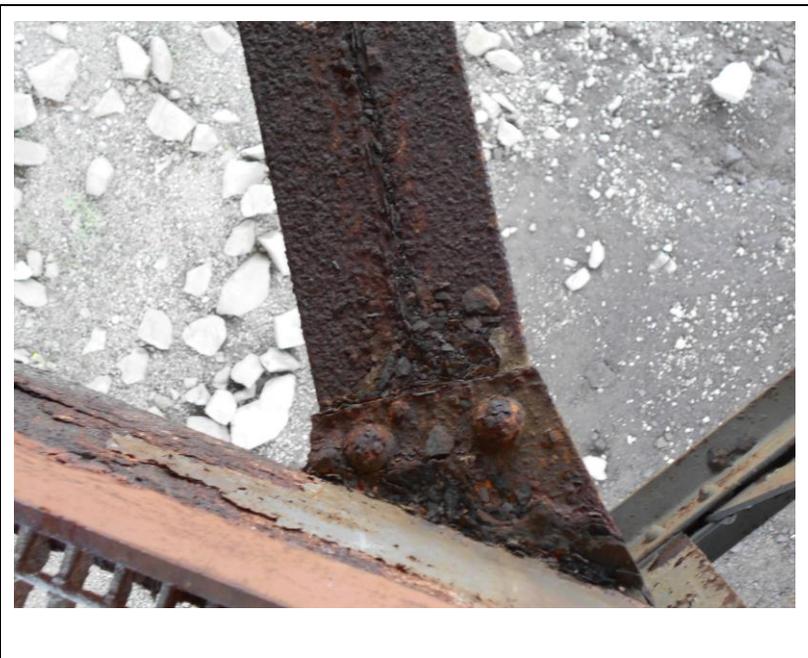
Bridge No. 00571A, Severe Section Loss of Inspection Walkway Channel Member.
